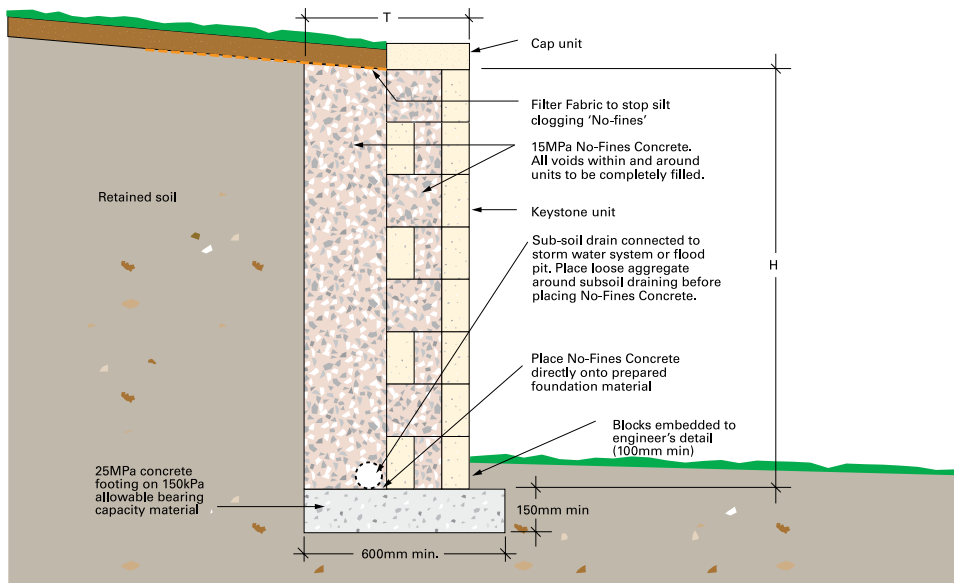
Typical Construction Detail - Keystone® No-Fines Concrete Mass Gravity Wall
